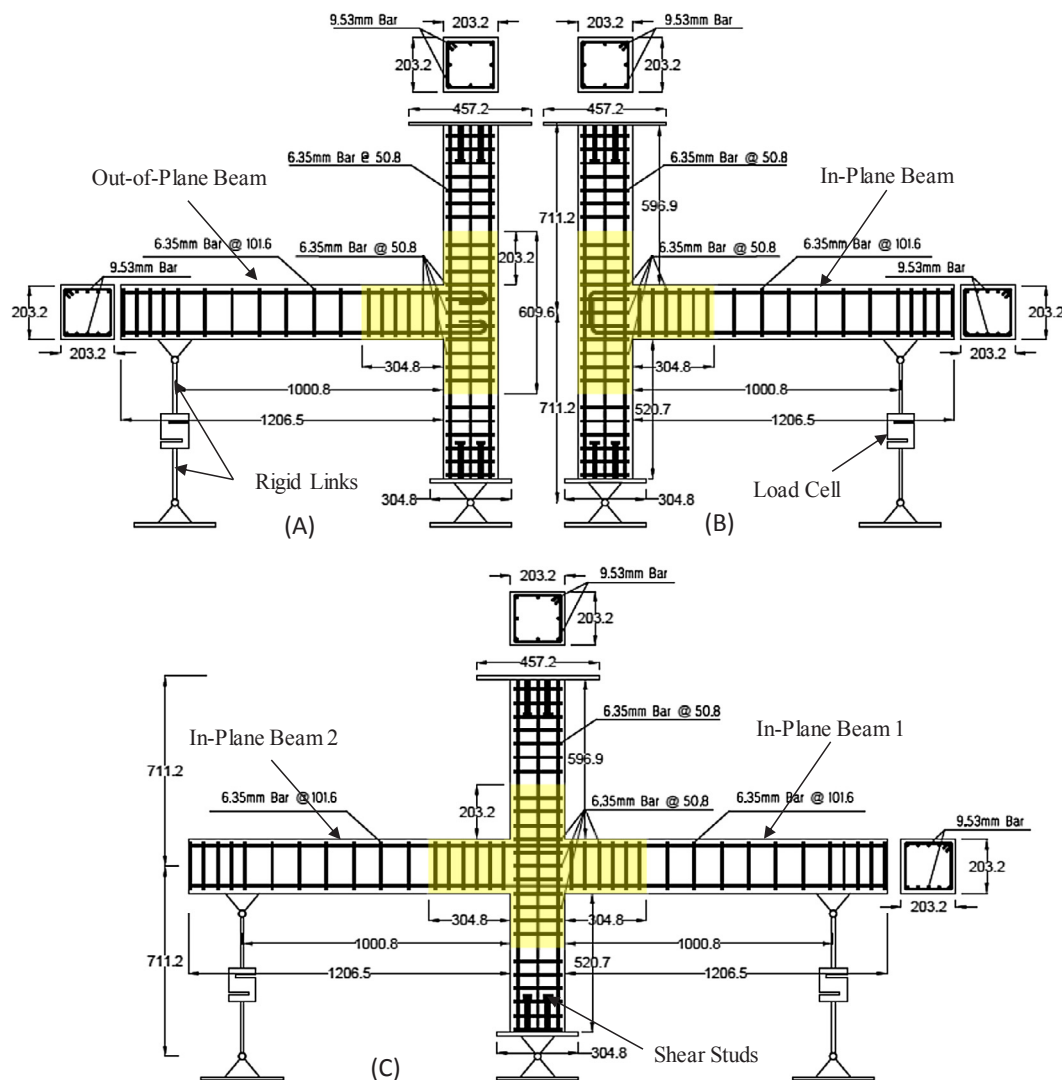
Beam-column subassemblies (shaded areas show the locations of ECC, dimensions are in mm): (A) out-of-plane view of corner and exterior subassemblies; (B) in-plane view of corner subassembly; (C) in-plane view of exterior subassembly.
